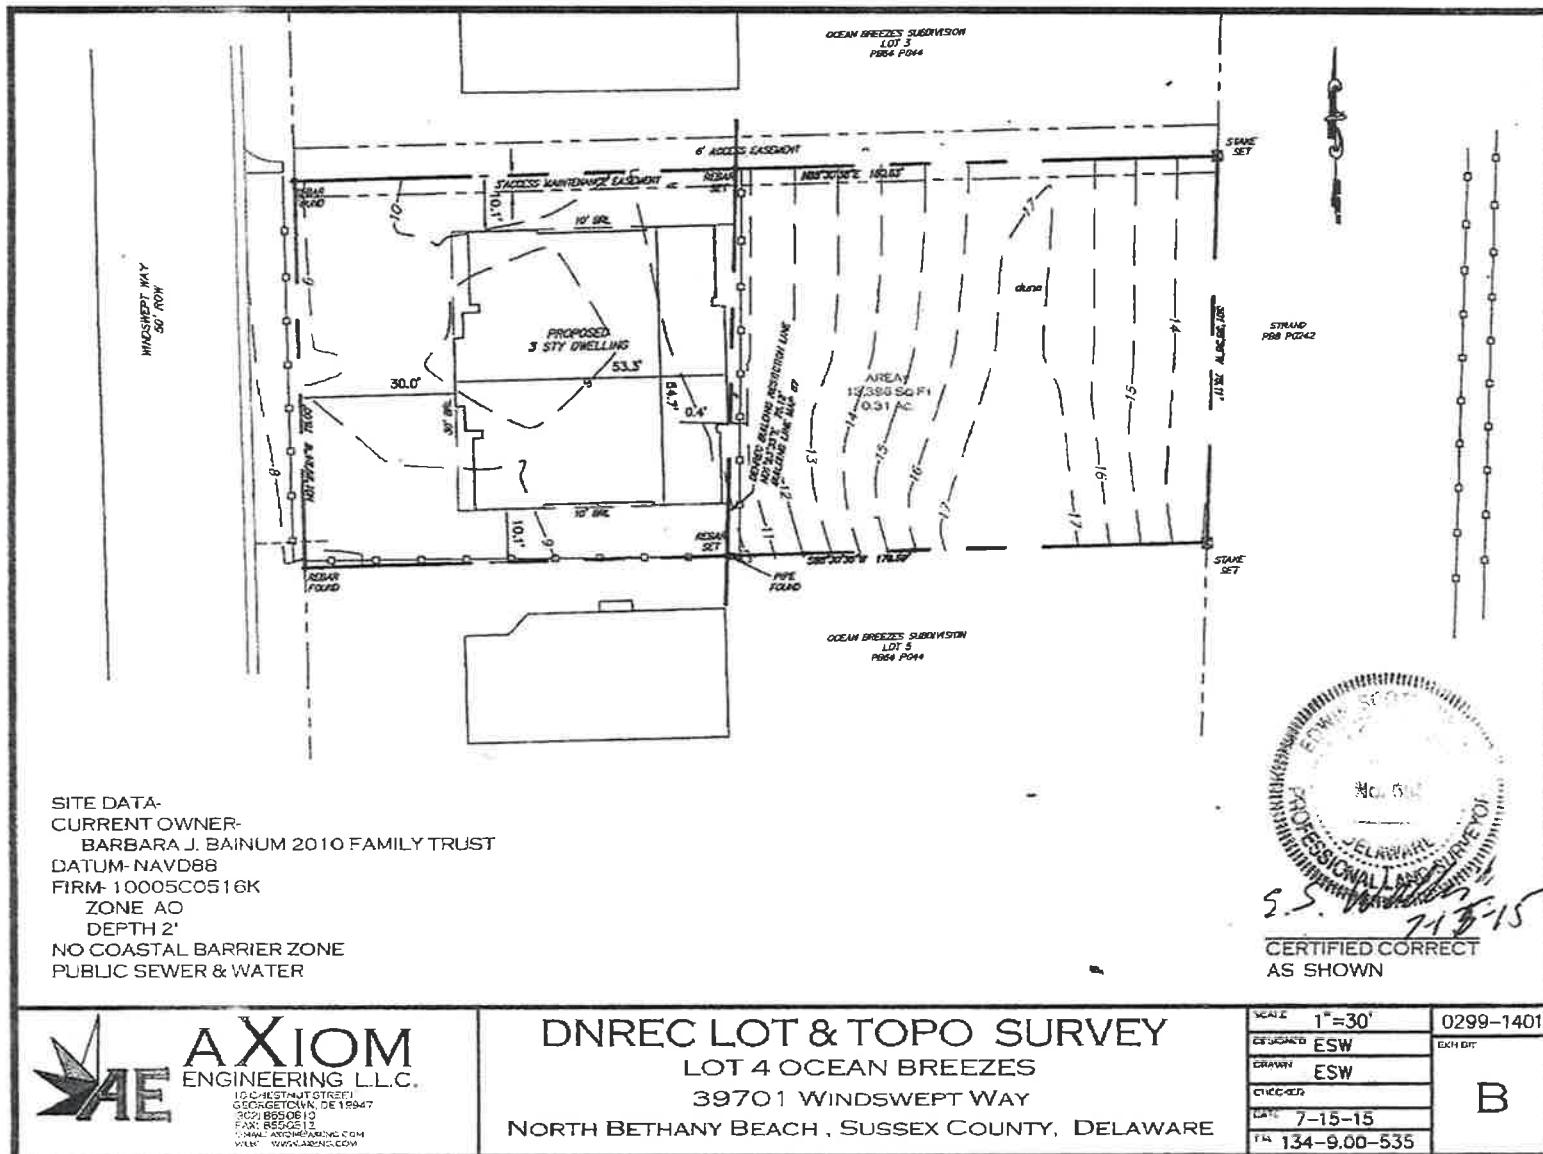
Plan view survey (prepared by Axiom Engineering, L.L.C.) showing “footprint” of proposed dwelling, topographic contours at 1’ intervals, and DNREC Building Line. Entire structure will be located landward of Building Line.
